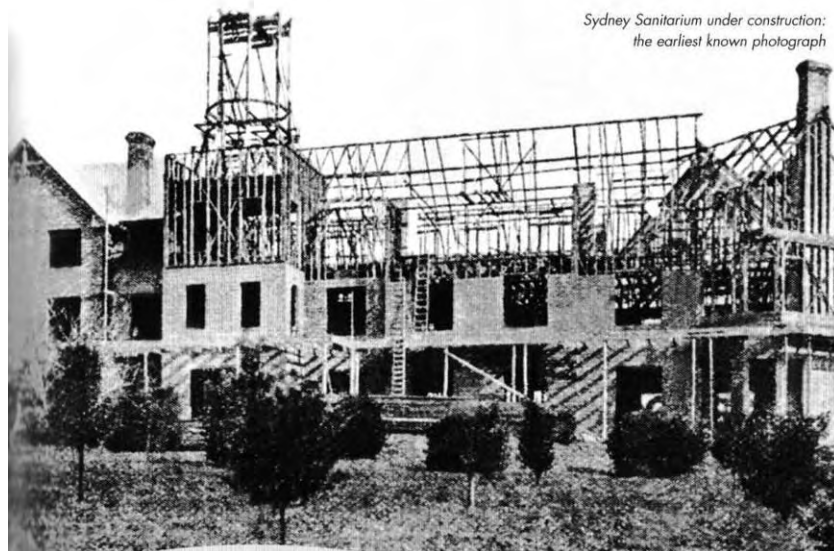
The first Sanitarium building under construction before 1903 (Patrick 2003:9).
